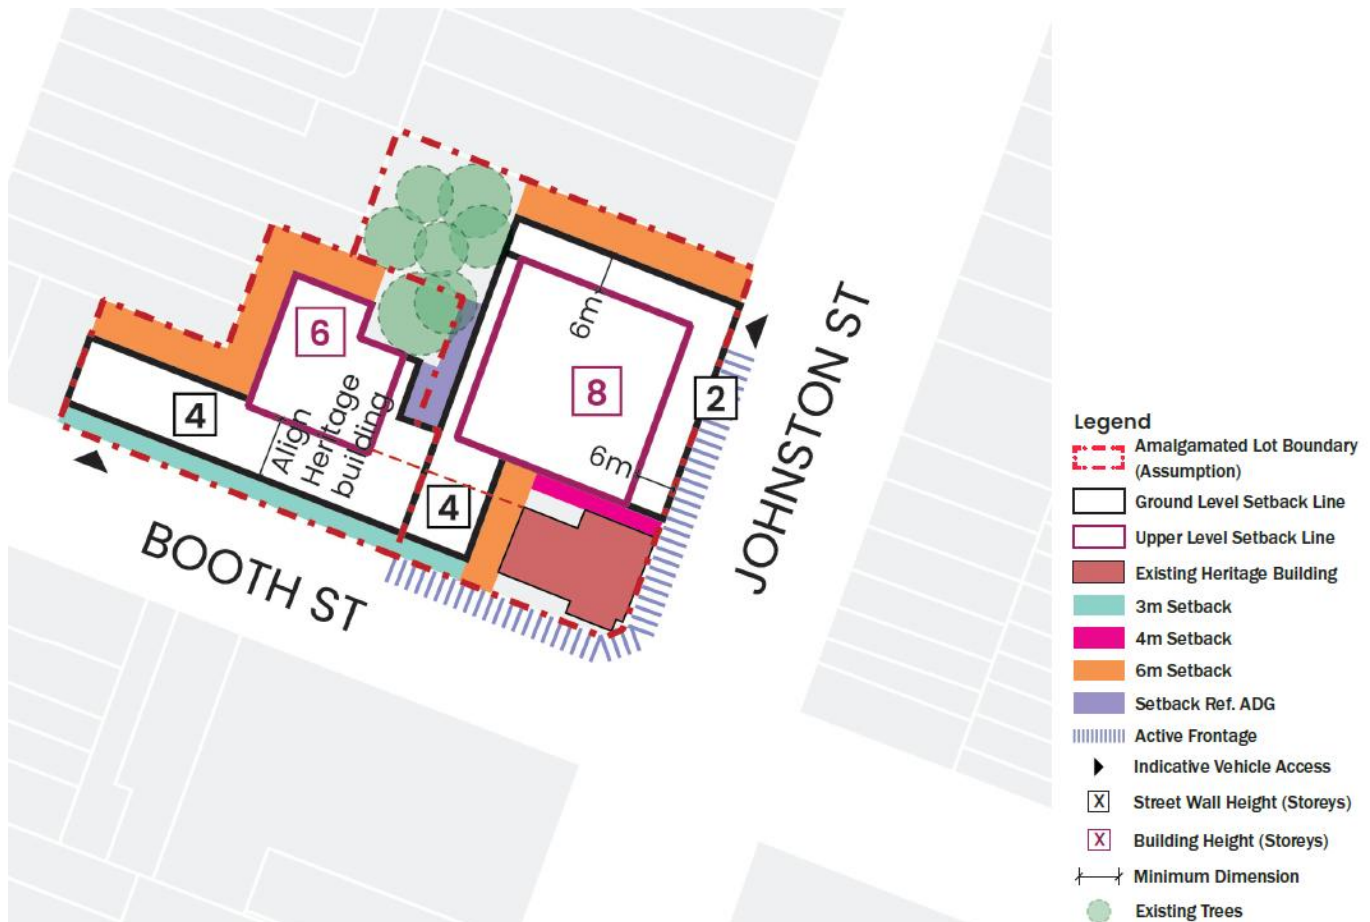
124-126 Johnston Street and 115 Booth Street - Indicative Layout and Design Principles
